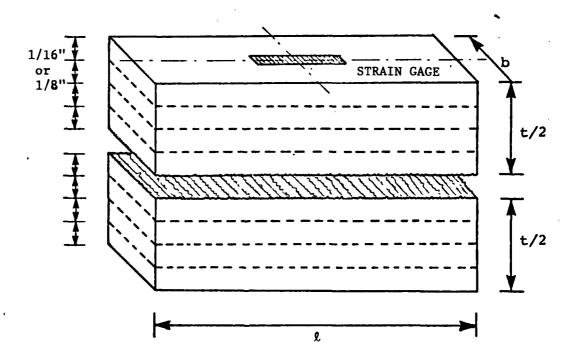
METHOD OF SLICING THE BLOCK
